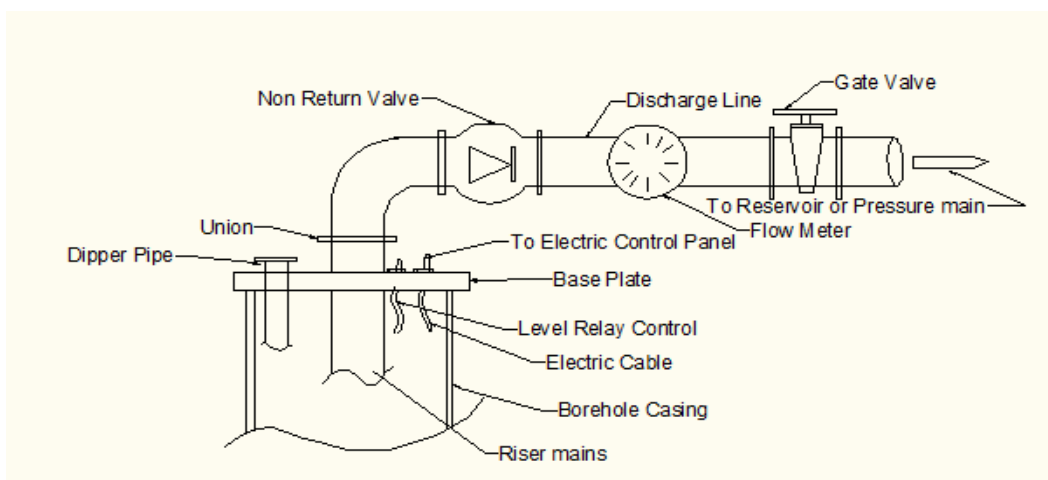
General Layout of Pumping Equipment Installation at the Wellhead – Electrical Pumps
